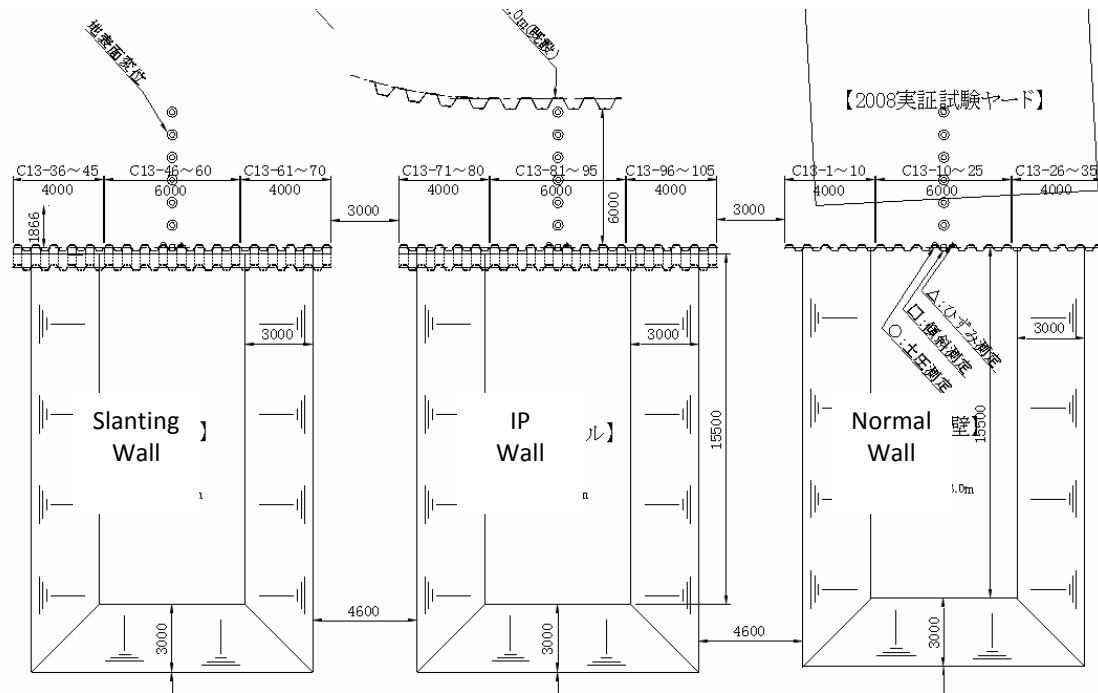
Layout of the Wall Tests (image courtesy of Giken)
